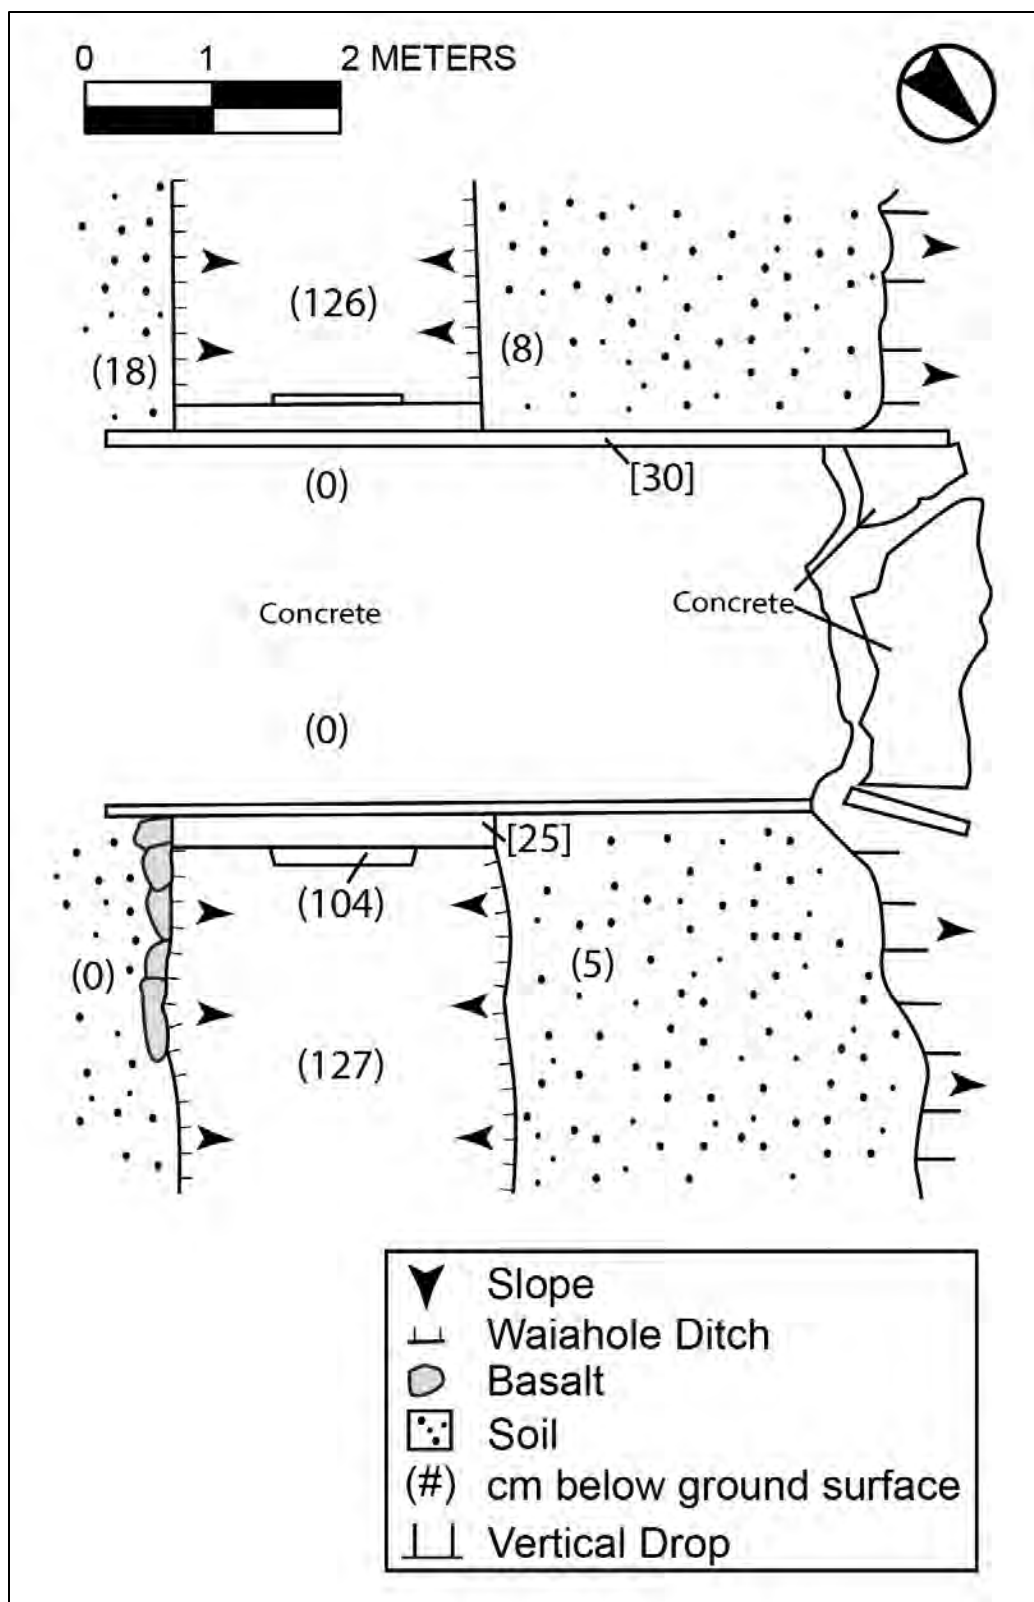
SIHP # 50-80-09-2268 Feature E culvert and ditch plan map
